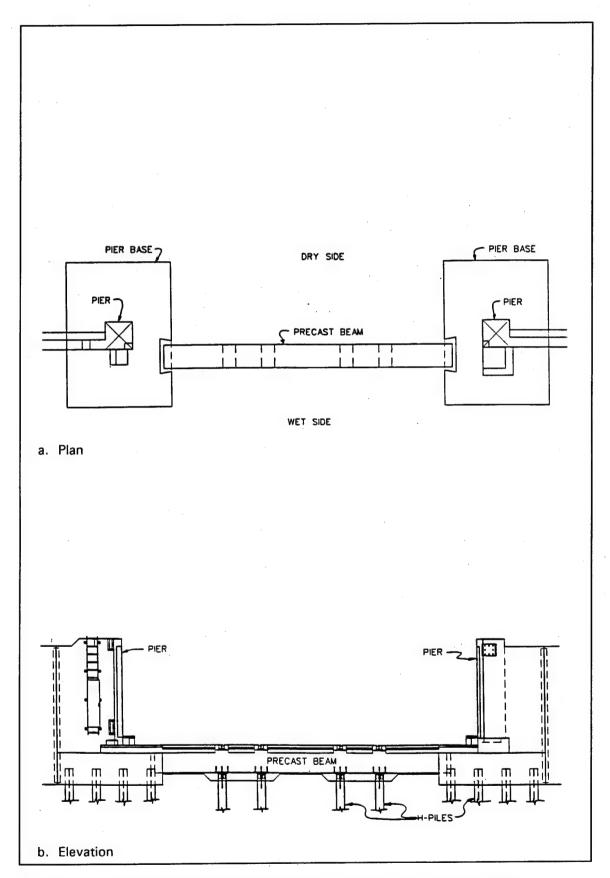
Closure structure, Pineville Levee and Floodwall (from Gunnels 1991)
